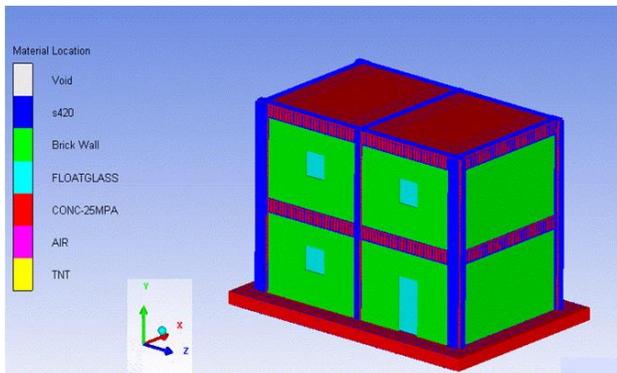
3D drawing model of a two-storey reinforced concrete building
